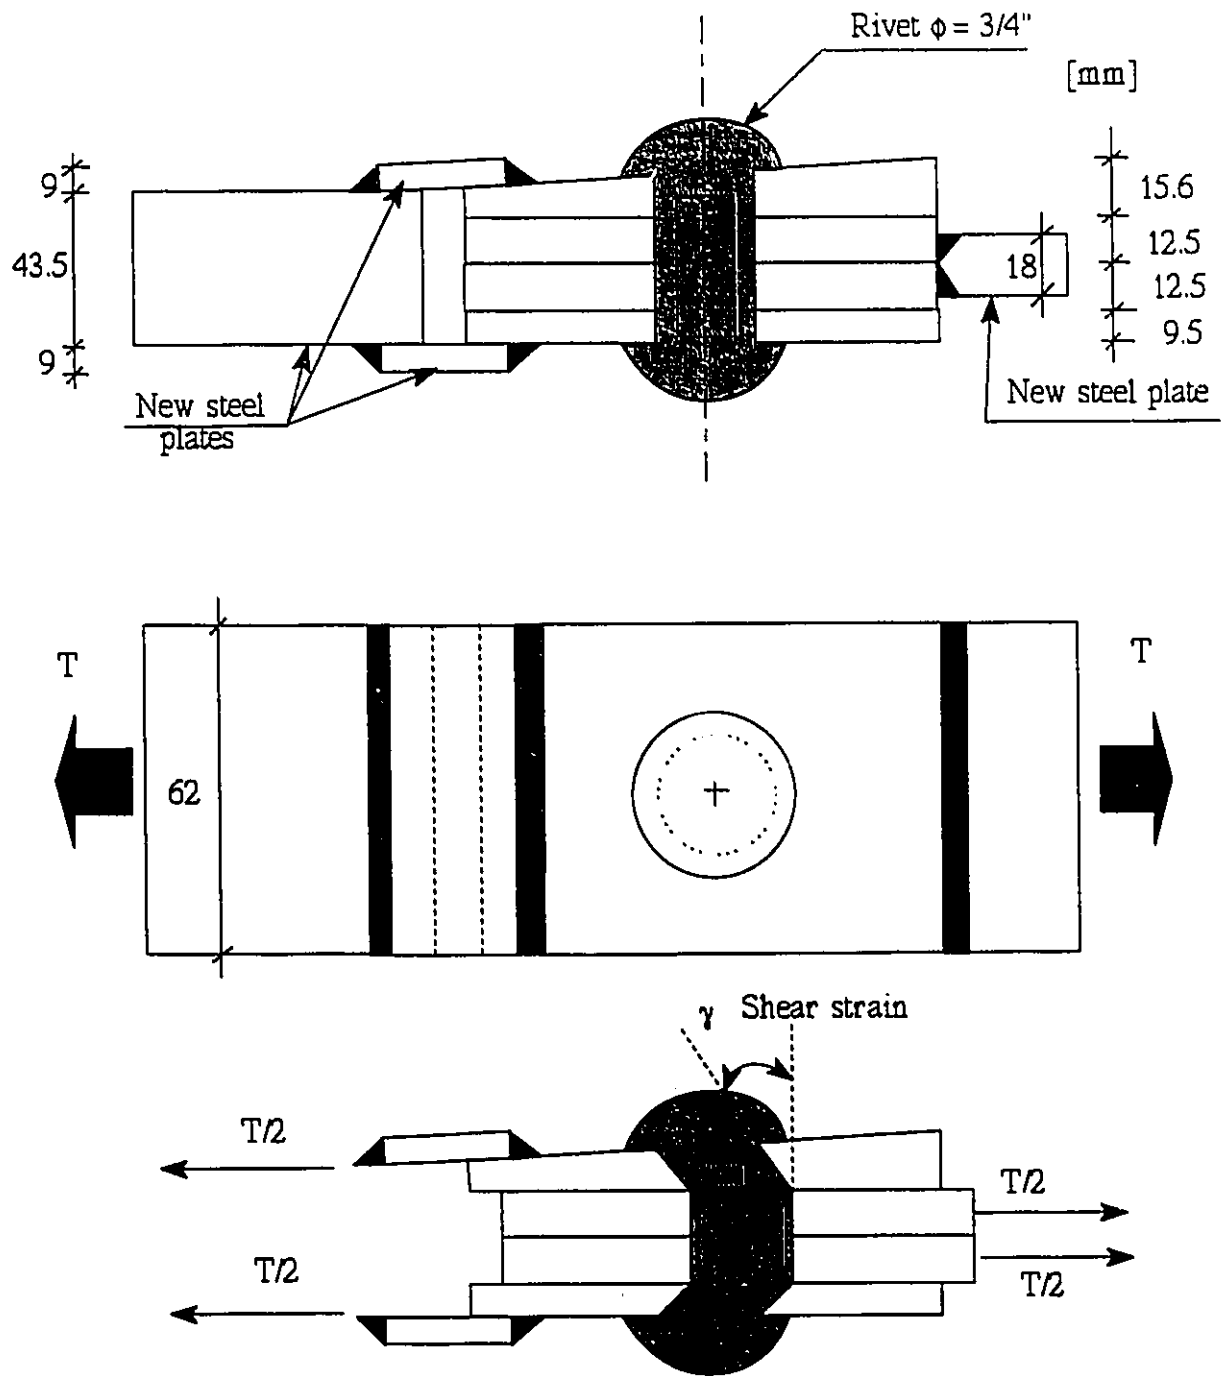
Detail of the specimen used for shear test of rivet and model used to calculate shear deformation of rivet
